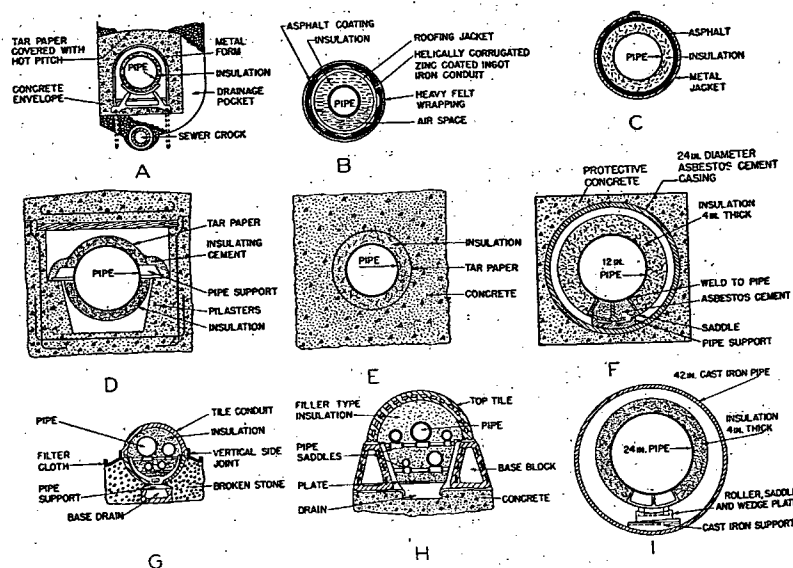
CONSTRUCTION DETAILS OF CONDUITS
